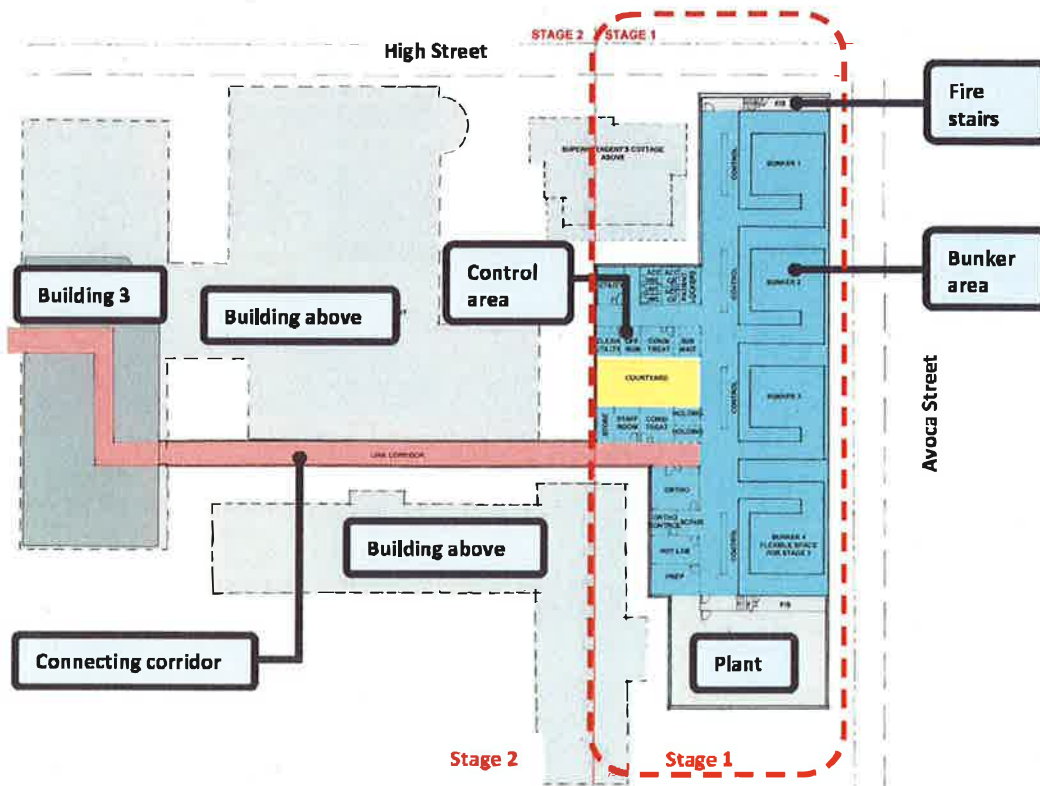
Stage 1 works and connecting corridor (Source: applicant's EIS, March 2012)
